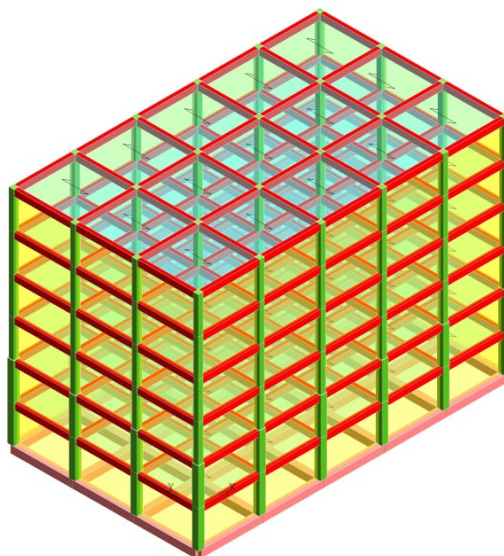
Reinforced concrete frame consisting of six floors considered in the analysis.
